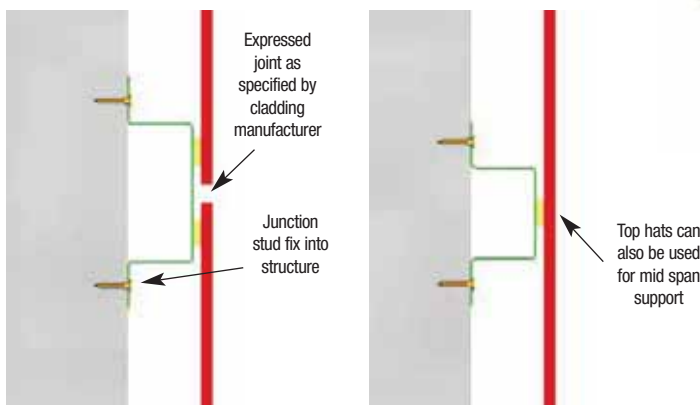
Top Hat Sections to Support Aluminium Composite Panel
